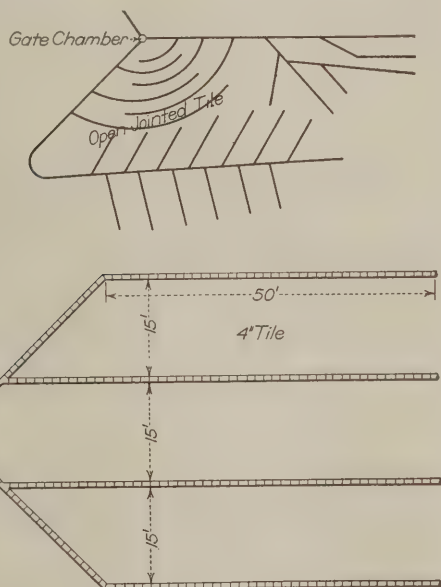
Ground Plans of Tile Sewage Disposal Systems
